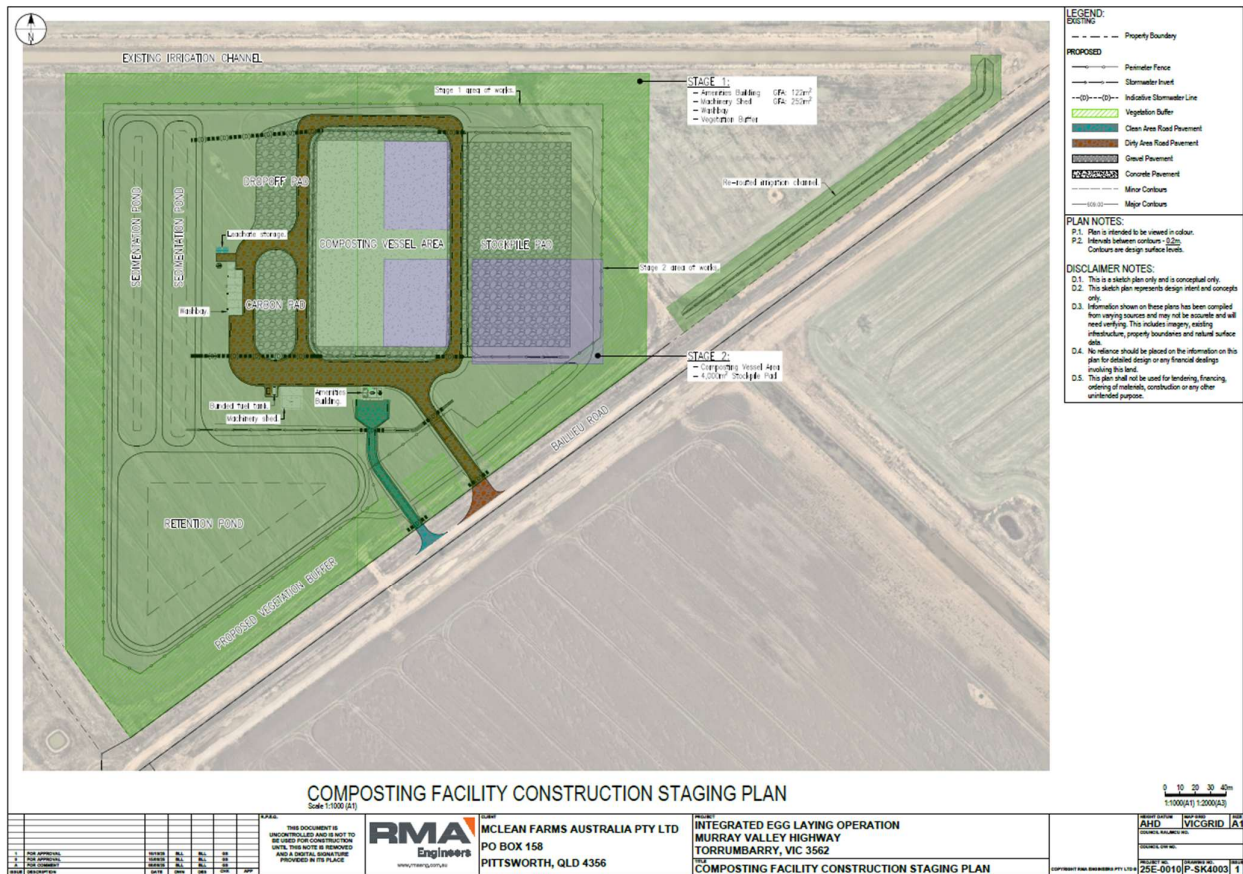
Composting Facility Staging Plan (RMA Engineers, 2025)
